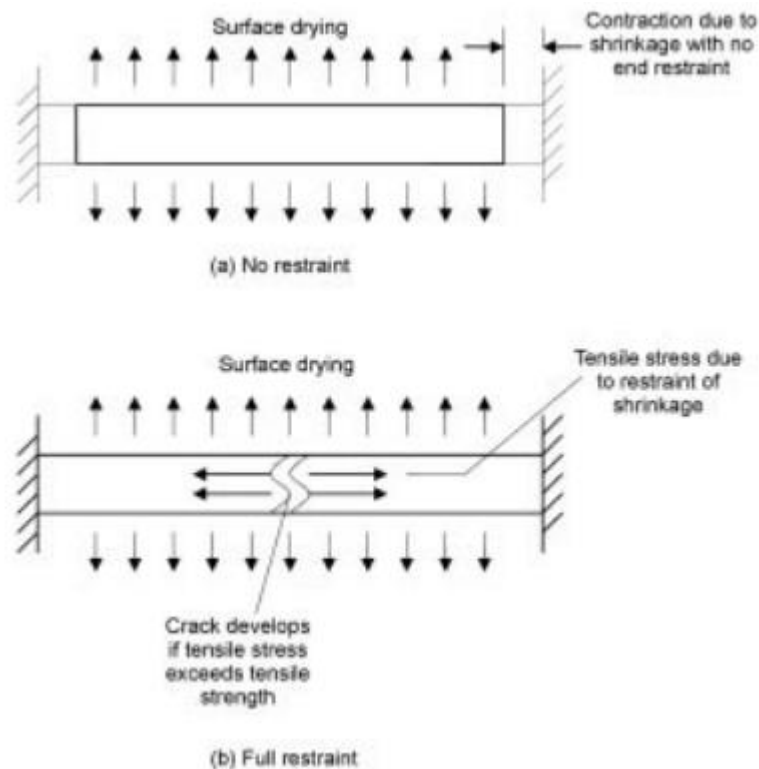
Example of full restraint of drying shrinkage in a concrete slab (Brooks, 2007)
